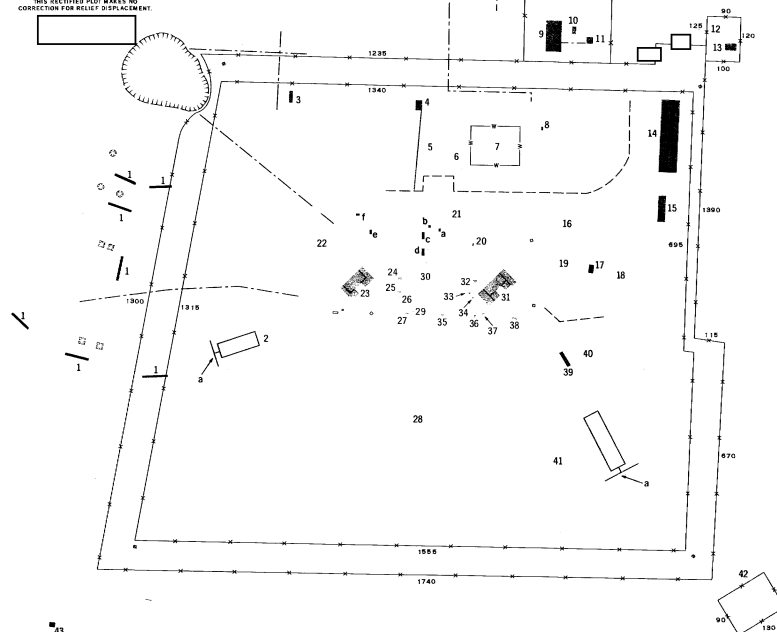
LAYOUT OF LAUNCH SITE D2, TYURATAM MISSILE TEST CENTER.
